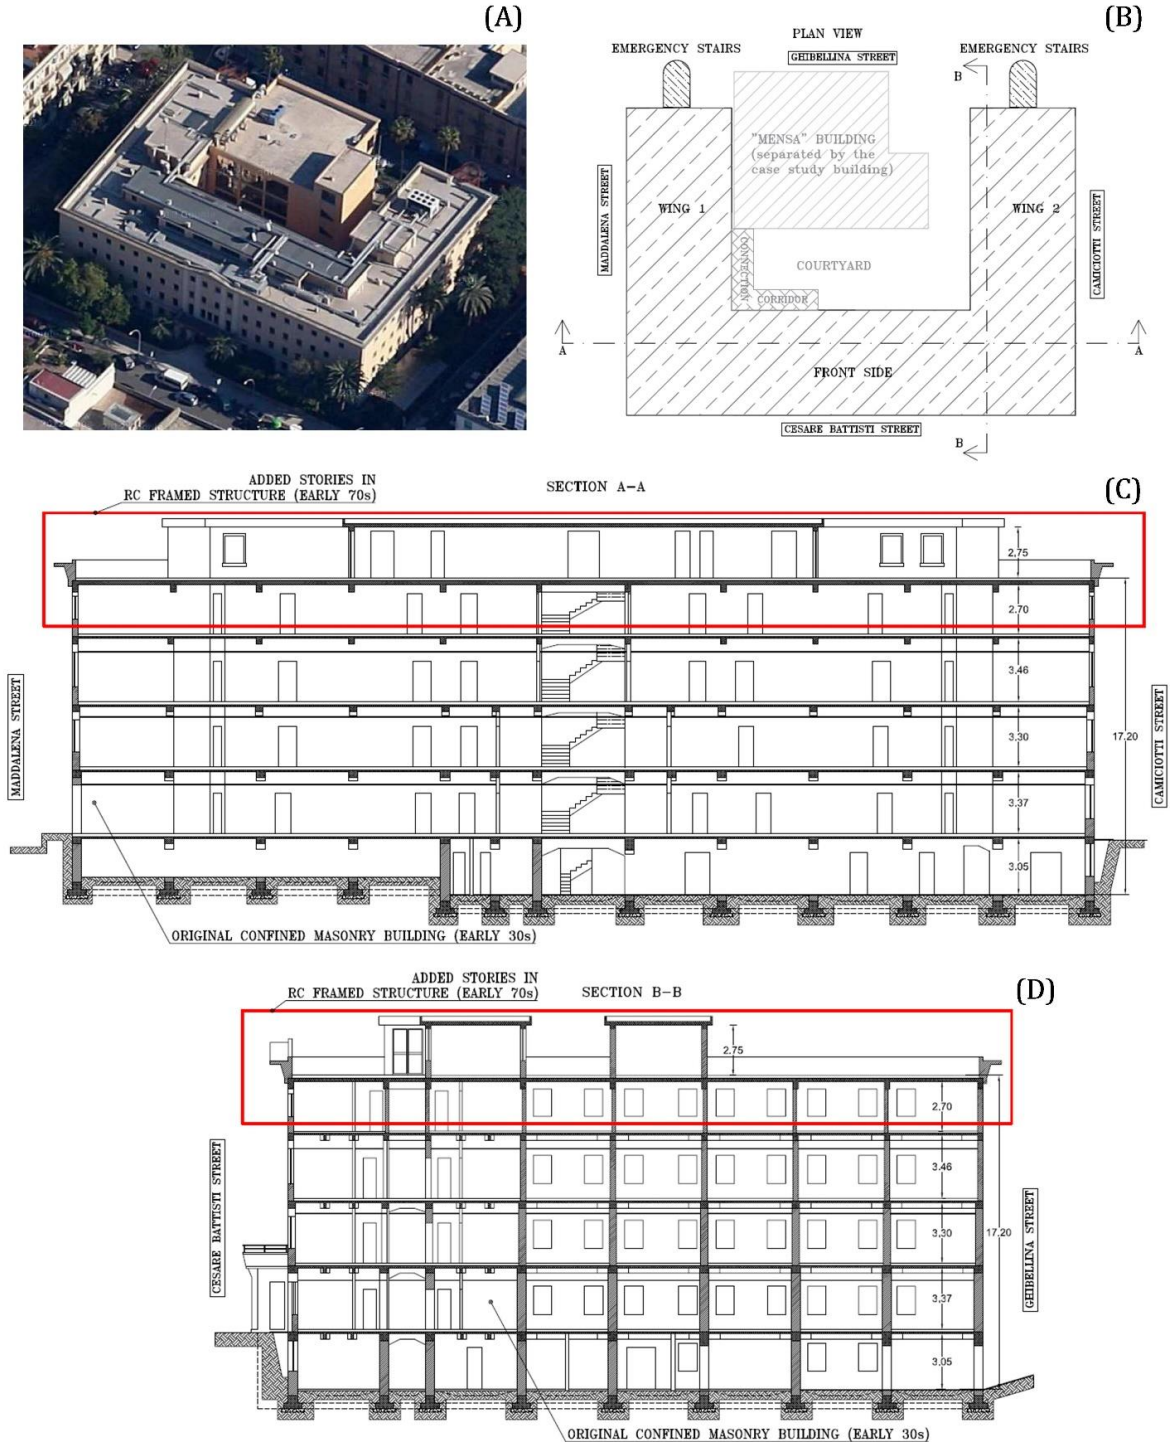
Case study building “Casa dello Studente”: (A) aerial view; (B) plan view; (C) and (D) front views (section A-A and B-B, respectively) with added reinforced concrete stories highlighted in red
